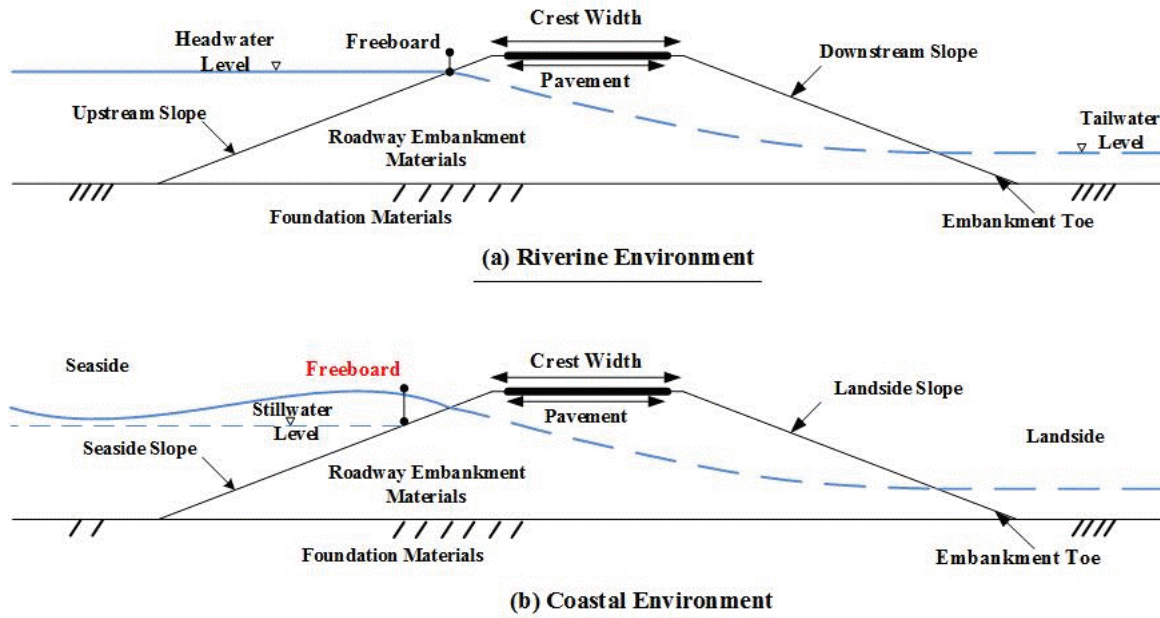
Typical roadway embankment section in (a) riverine and (b) coastal environments.
